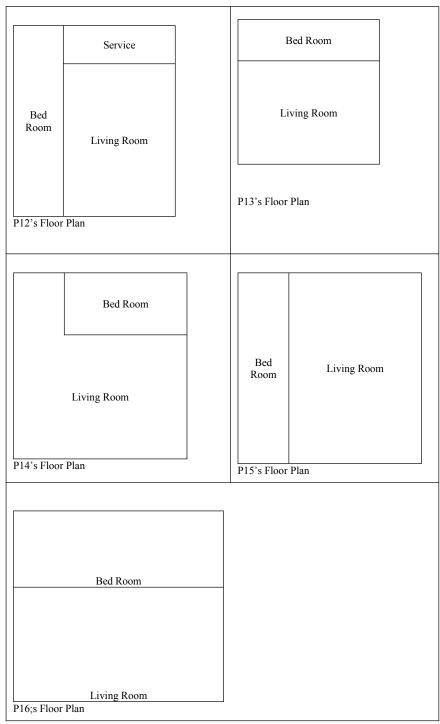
Floor Plan of P12, P13, P14, P15, and P16 (Source: Survey 2014)
